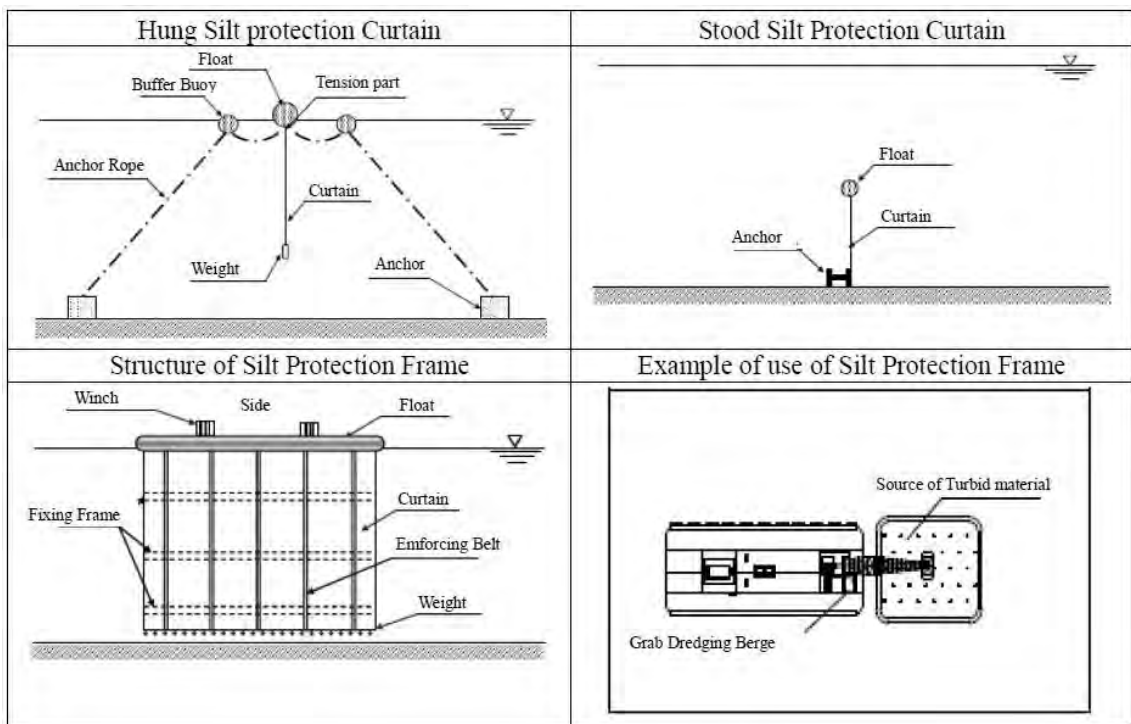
Installment example of silt protection curtain and frame
